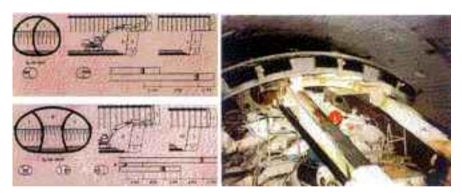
Excavation methods-conventional: top left- single sidewall drift;bottom left- twin sidewall drift, TBM technology (example from Paris metro)
